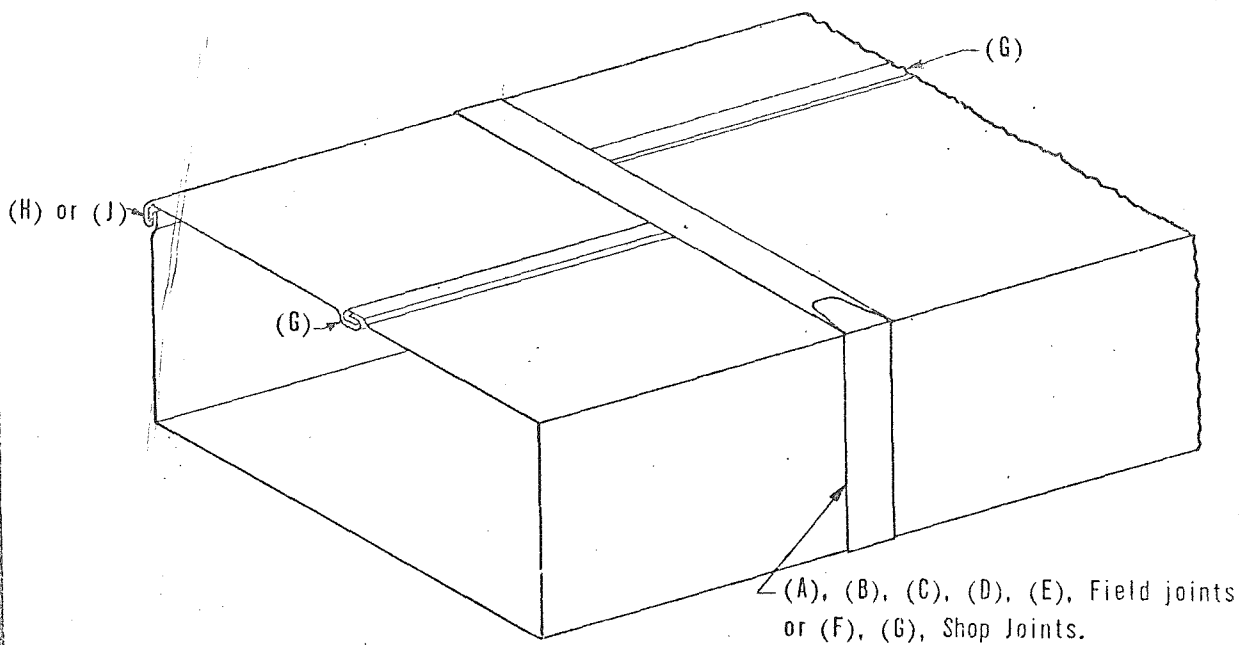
(G) ACME LOCK OR GROOVED SEAM
